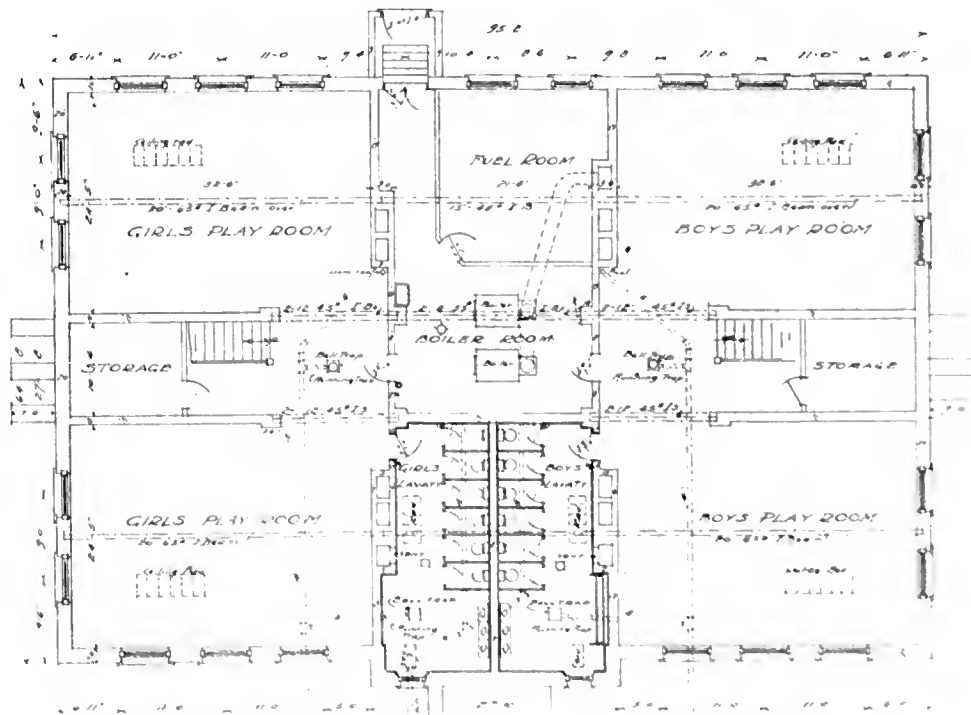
Basement plan showing play rooms, lavatories and heating equipment.
